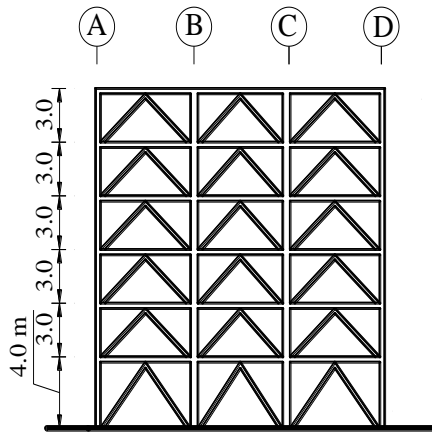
Elevation of exterior frame along axis 1 and 6 in short direction
